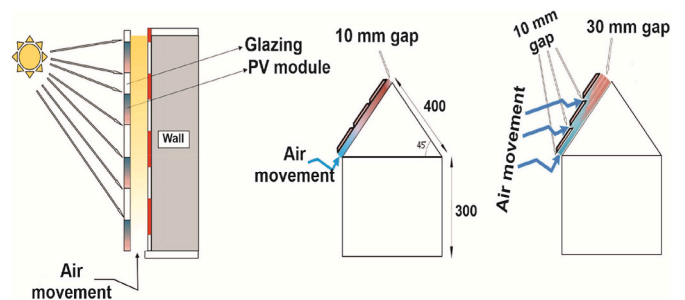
A staggered installation on the walls and roof of the building for BIPV [132,133].
